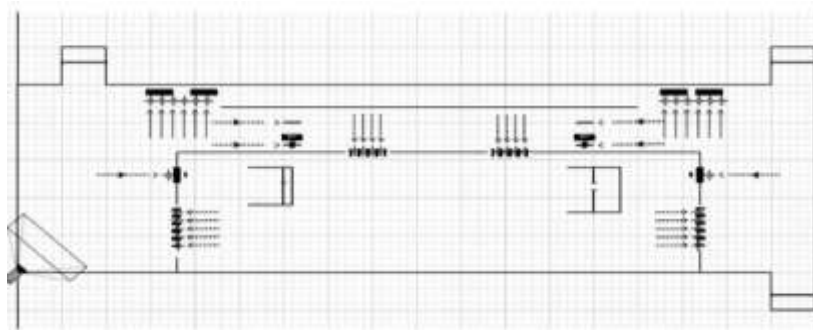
Layout of the original facilities of Xiaolingwei subway station
